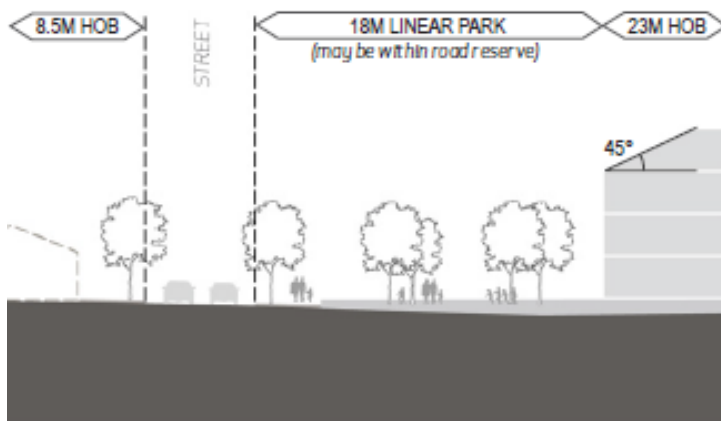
Indicative cross-section showing the form of buildings adjoining the linear green space
